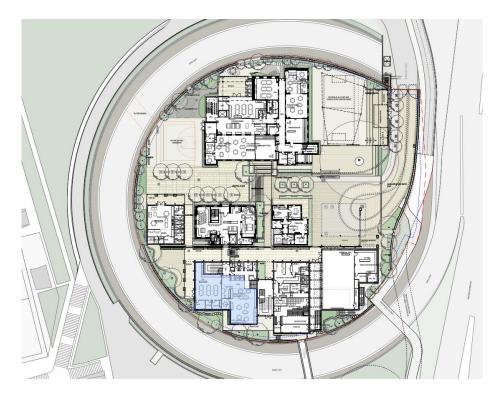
Proposed Plan – Ground (fjmt, 06.12.19)
